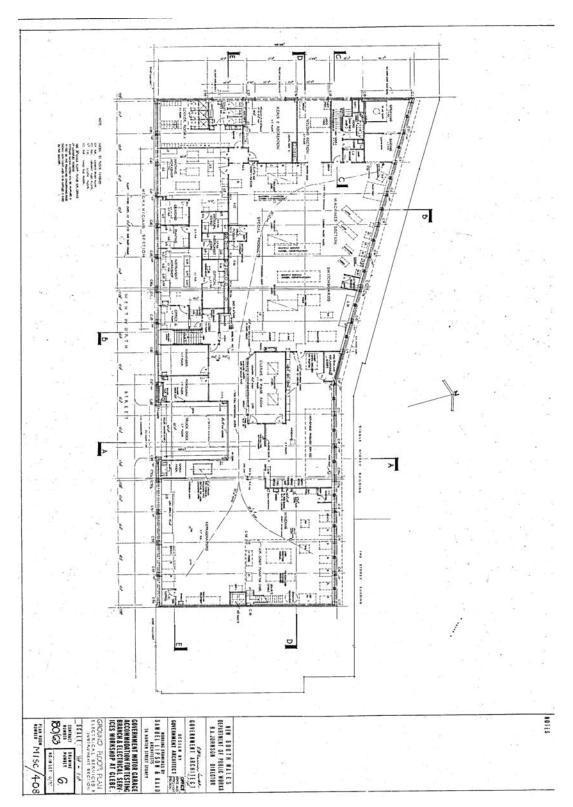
First floor plan of the Testing and Inspection Branch building of the Public Works Department
